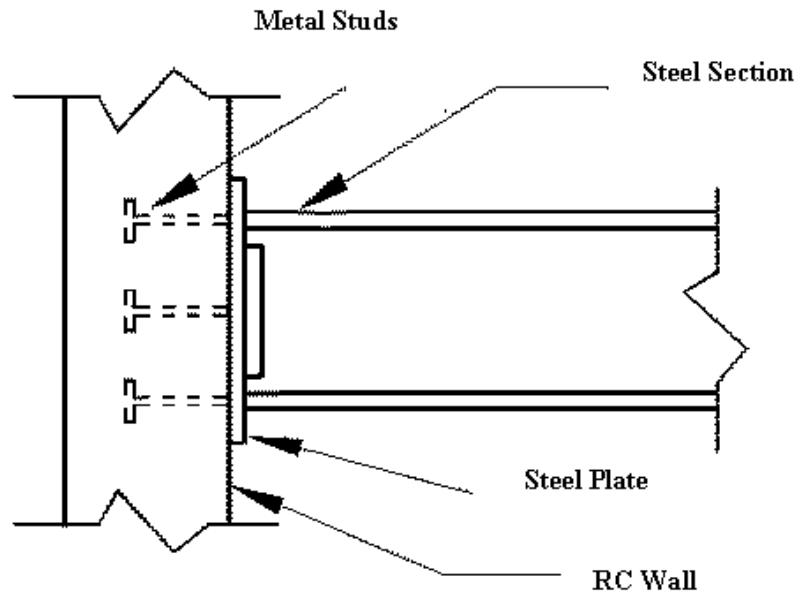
RC Wall-Steel Beam Connection for Low Rise Buildings (Gong and Shahrooz, 1998)
